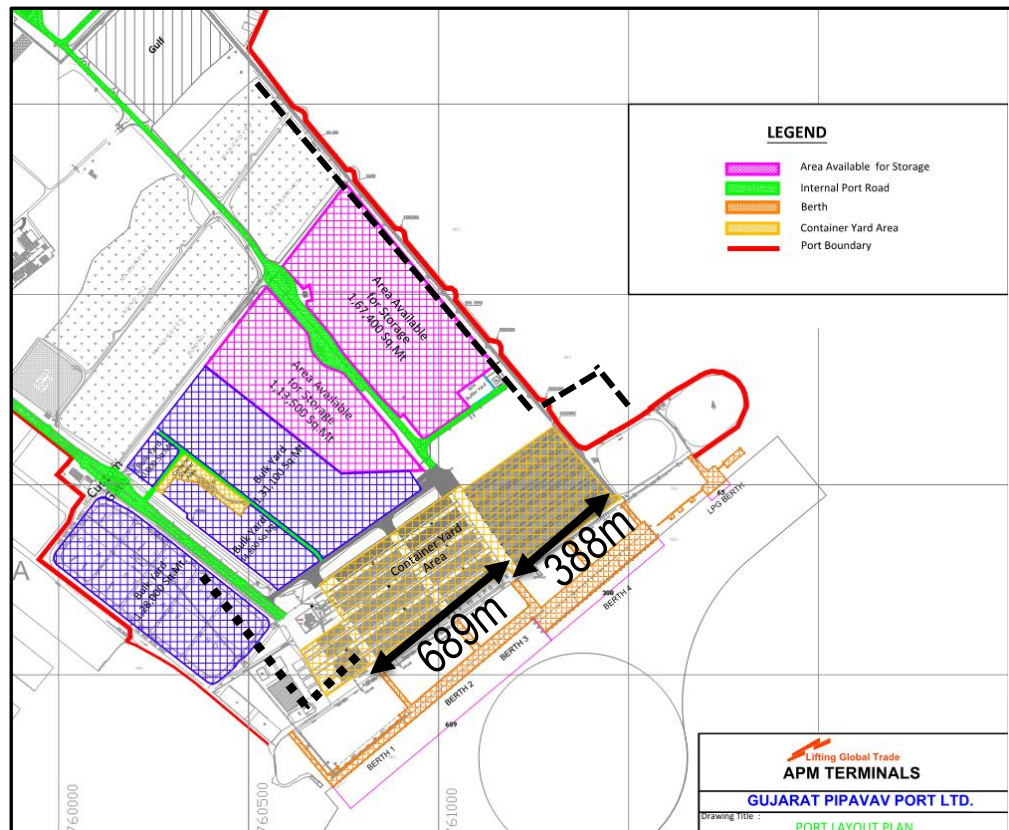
Pipavav port plan, courtesy of APM Terminals.
